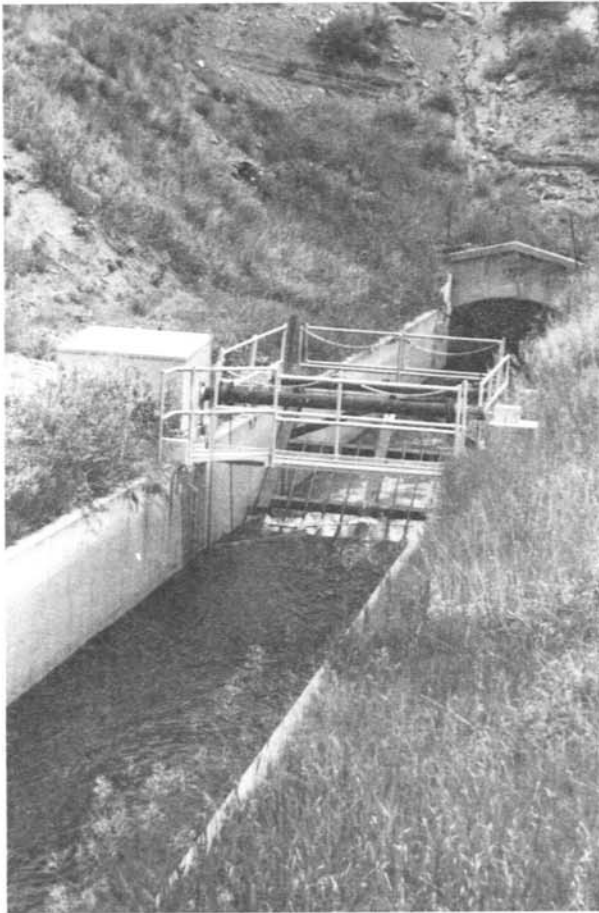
Upstream view of the trashrack structure showing the motor and gear reducer house, hoist cable shaft, and retrieval cable.
